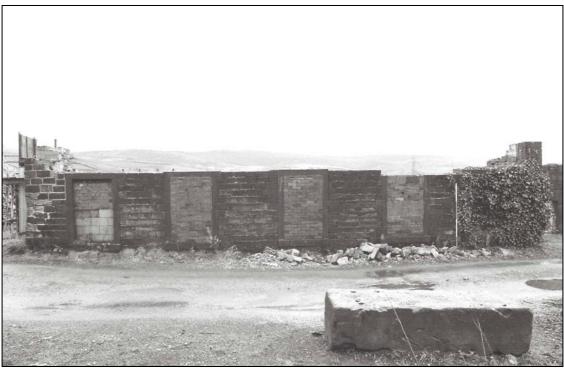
, 11: view of the extant NW Elevation of the northeast building (openings H-L), from the northwest
